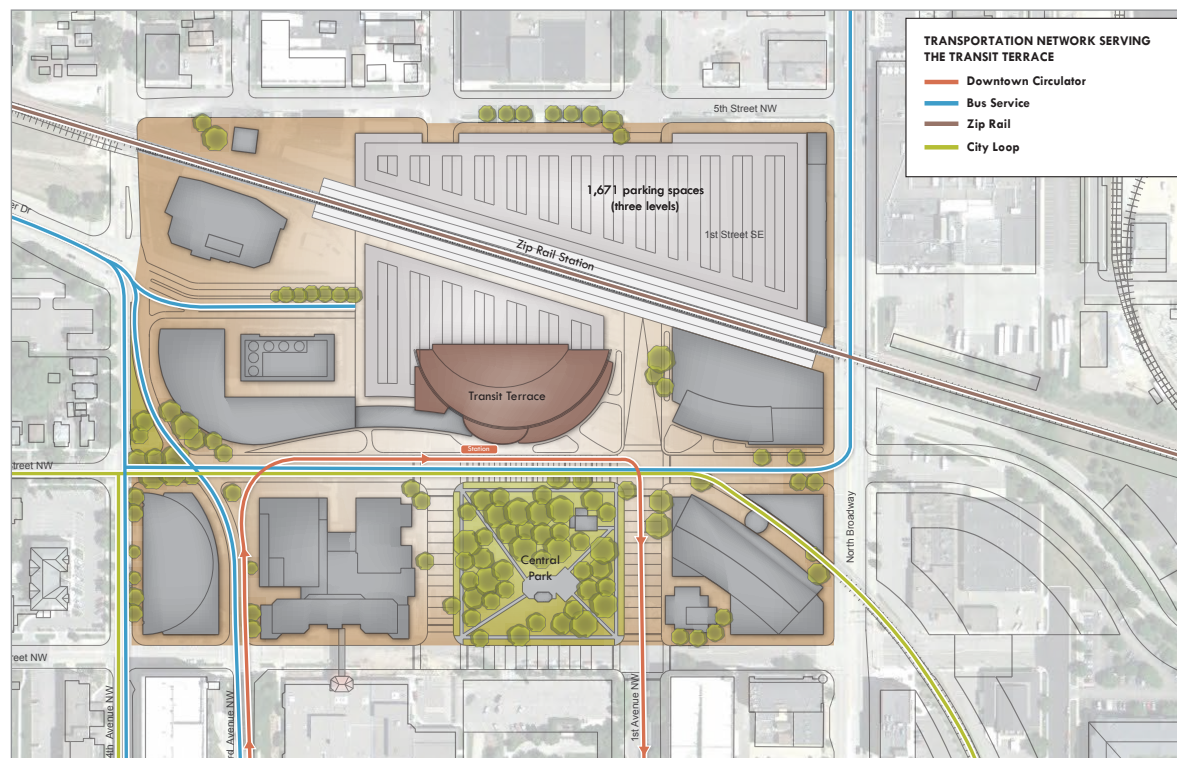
CONCEPTUAL TRANSIT TERRACE SITE PLAN
